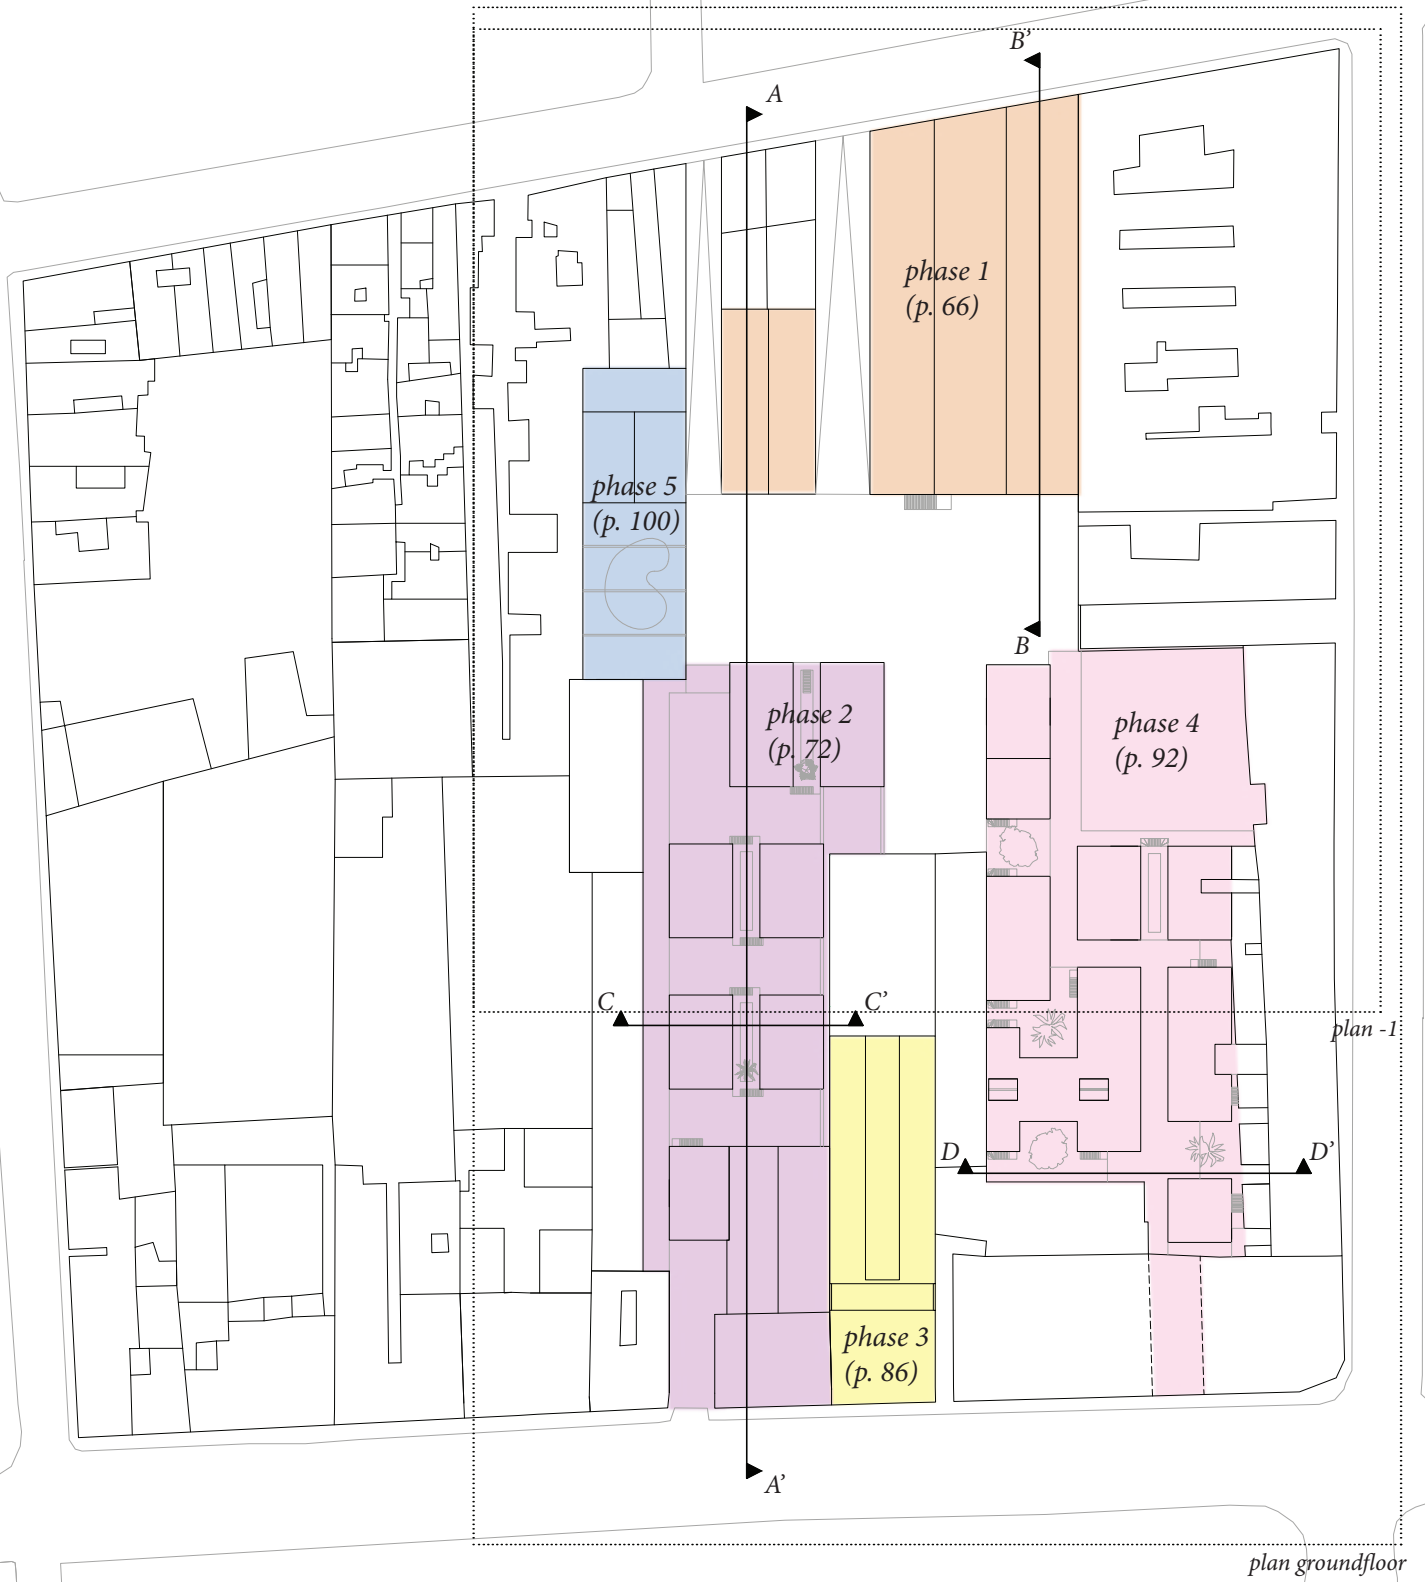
overview scheme: phasing, plans & sections (scale 1/1000)
